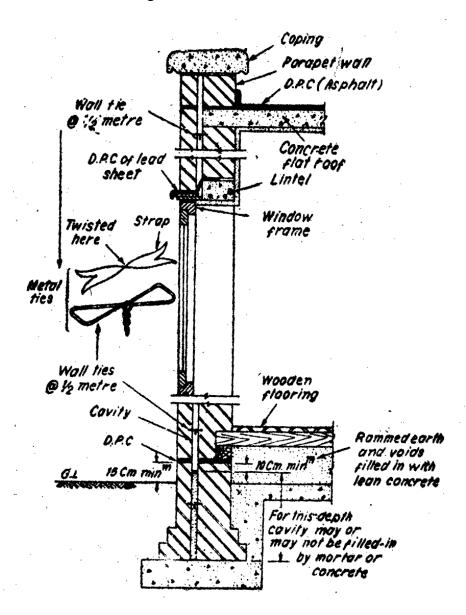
Cavity wall construction and D.P.C. details for flat roofs
